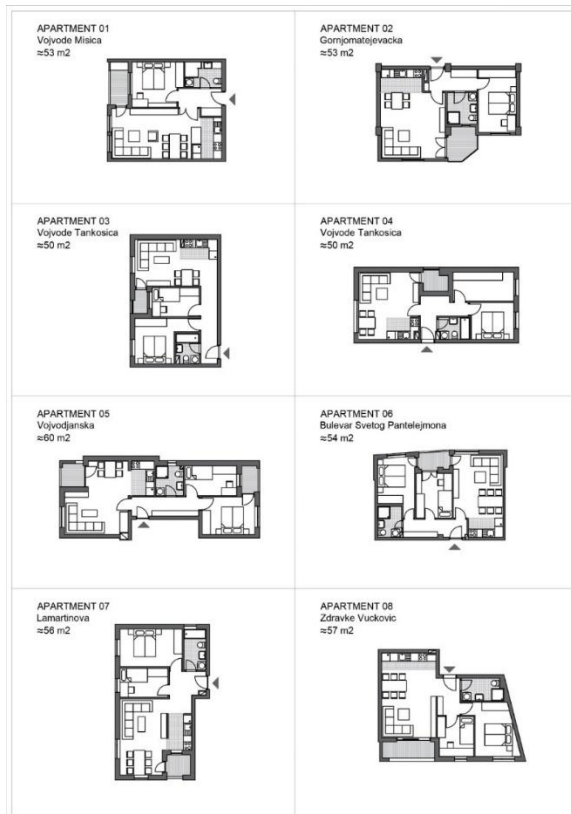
Floor plans of the analyzed apartments, source: drawings are authors' interpretation
